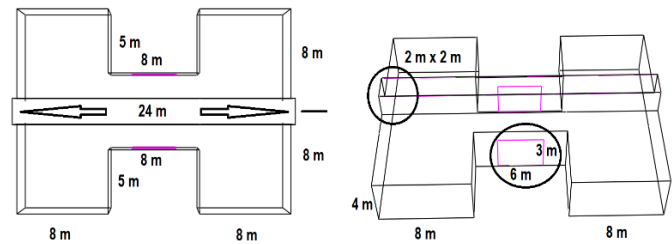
The medical centre introduced in the current study. It has a length of 24 m, a width of 16m and a height of 4m with two main doors leading to the parking places. A ventilation duct at the top of the building is proposed, it has a width of 2m and a height of 2m along the centre, *i.e.* with a length of 24 m.
